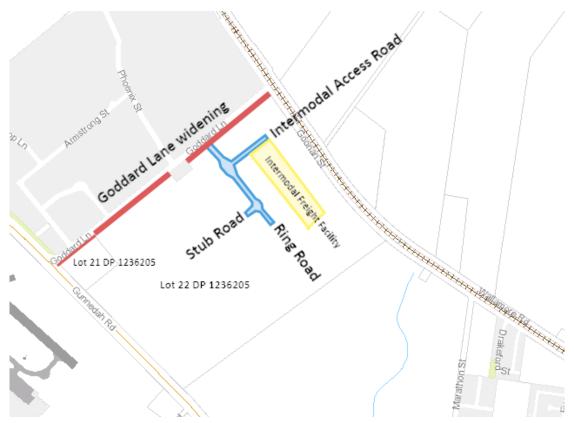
Project reference naming for Goddard Lane widening (red) and TGGP internal roads (blue) proposed to be constructed as Stage 1 of the TGGP.
